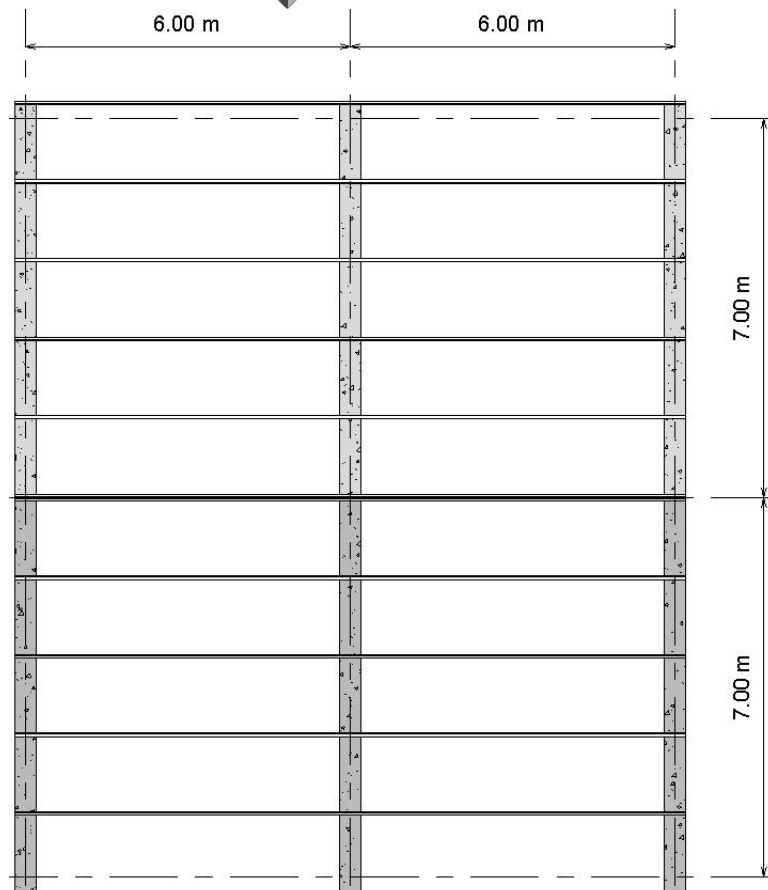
Roof area supported by a typical interior column for Example 1.3-3.
